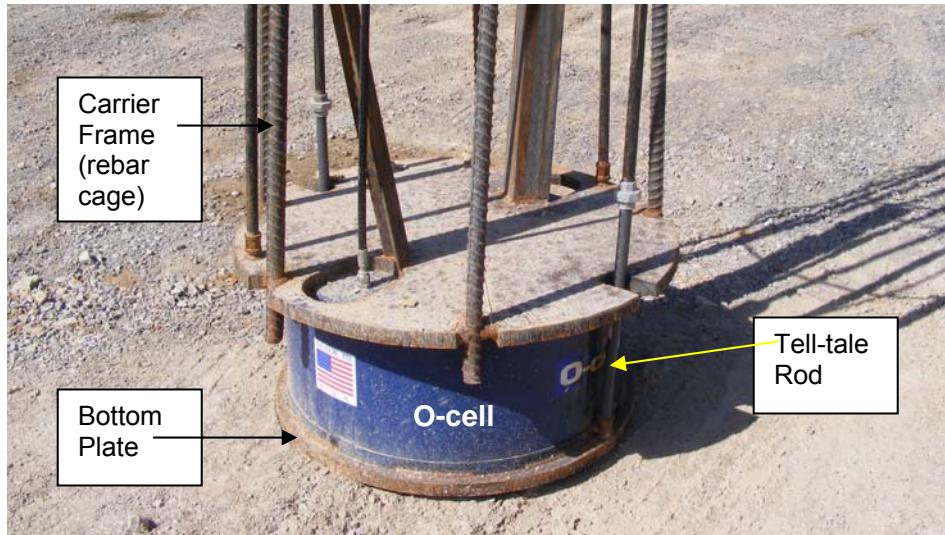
Close-up of O-cell Assembly (Test Shaft 2)
